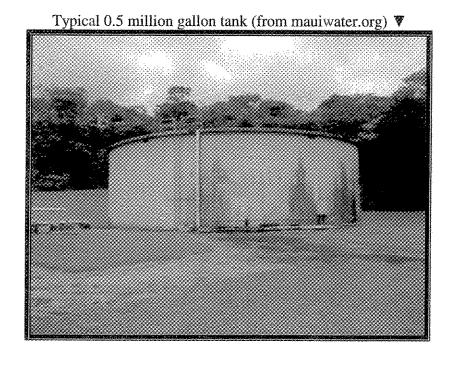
Photos of Typical Reservoir and Fill Site Facilities
